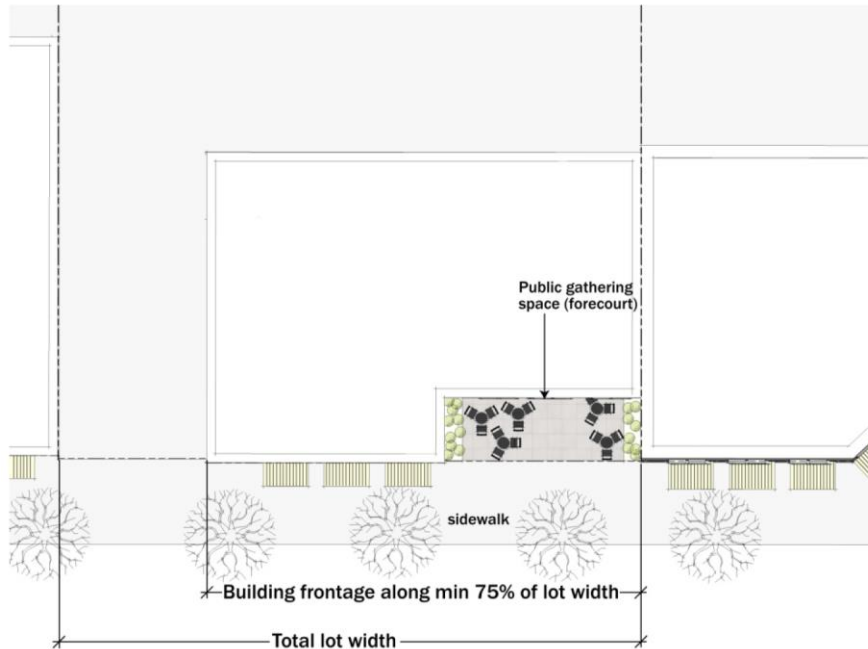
REQUIRED BUILDING FRONTAGE ALONG COMMERCIAL STREET AND PRINGLE CREEK
